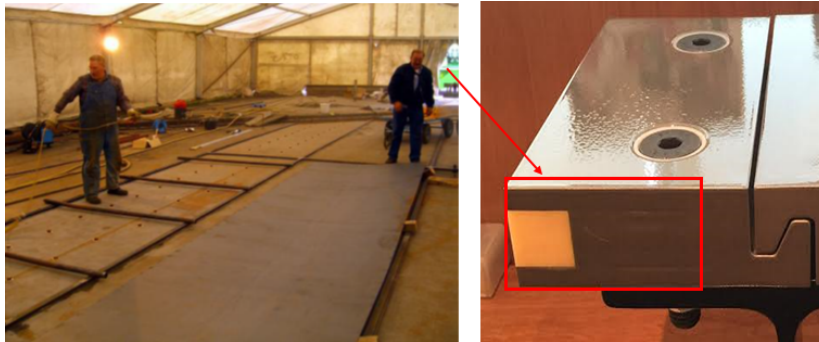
(a) The top faceplate is placed on top of the perimeter bars/elastomer spacers. (b) Cross section of an SPS-panel; the perimeter bar used is highlighted [Source: SPS - Engineering Details, Intelligent Engineering Limited]
